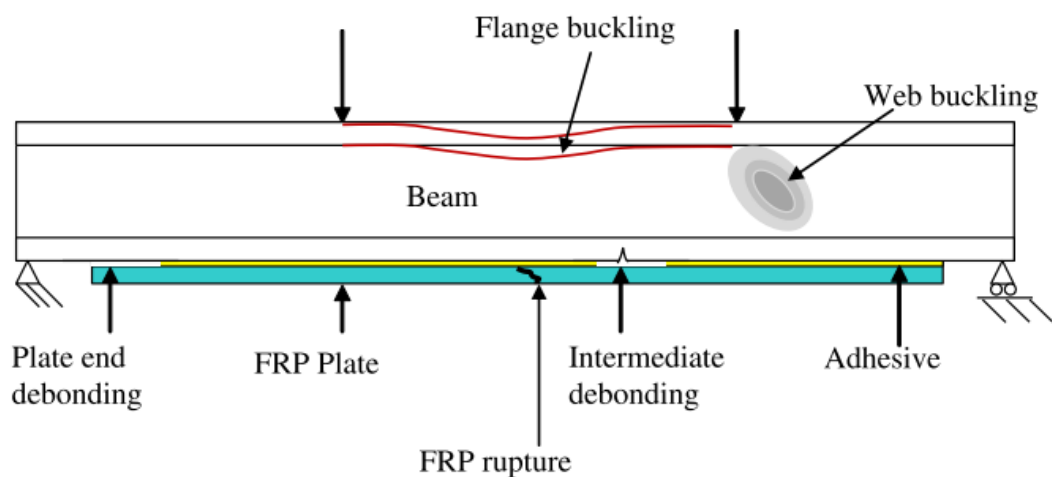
Some failure modes of steel beams strengthened with CFRP (Source: Teng et al, 2011)
